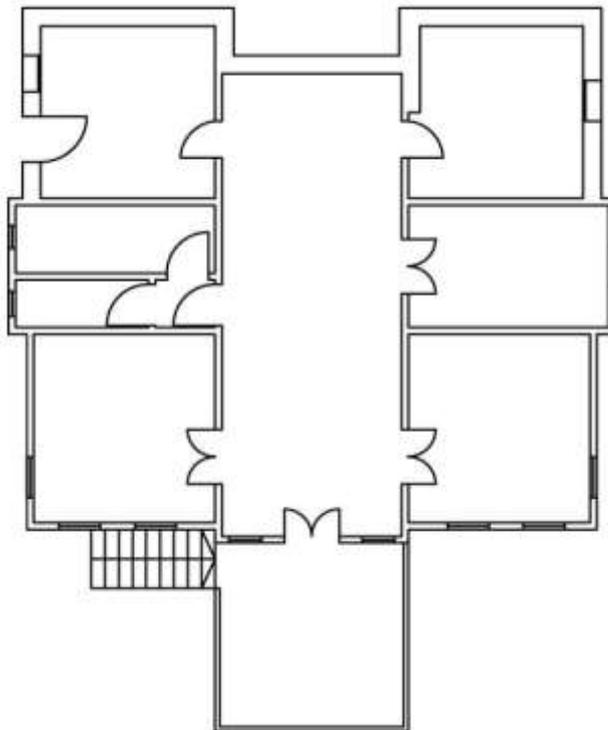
The basement floor plan of the house at 166 lot 5 parcel
